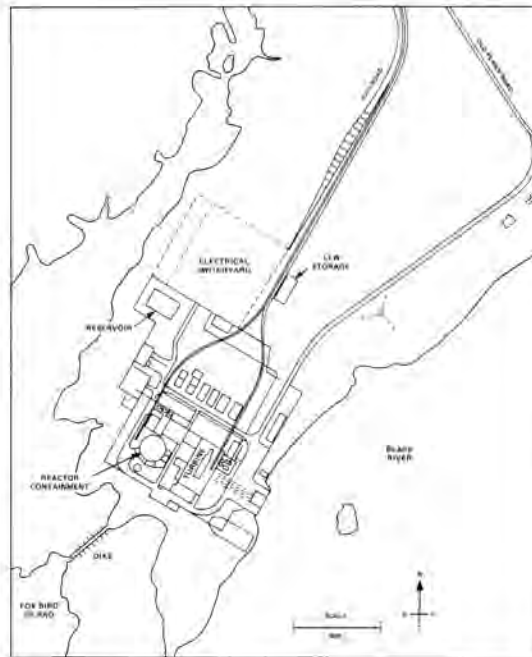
Maine Yankee Atomic Power Plant Site Plan.
